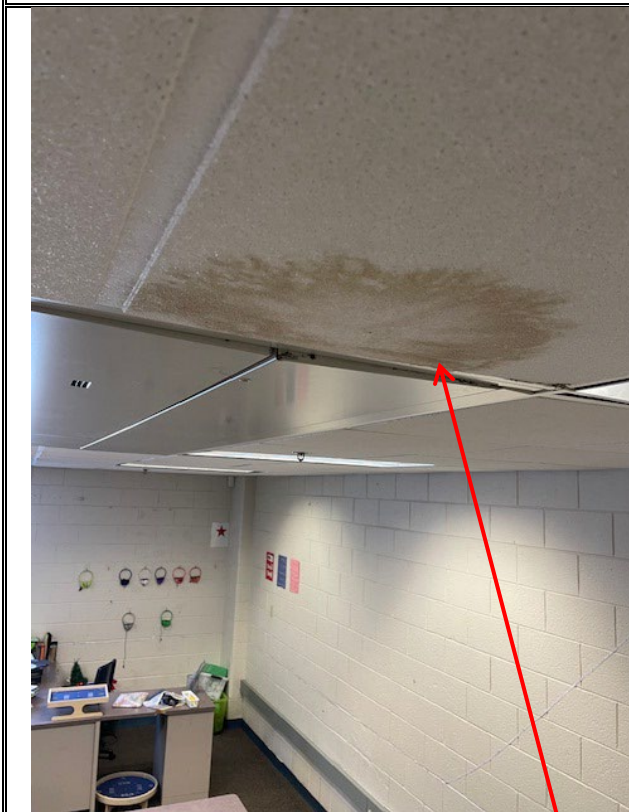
View of Classroom B032 with stained ceiling tiles at ceiling AHU unit
